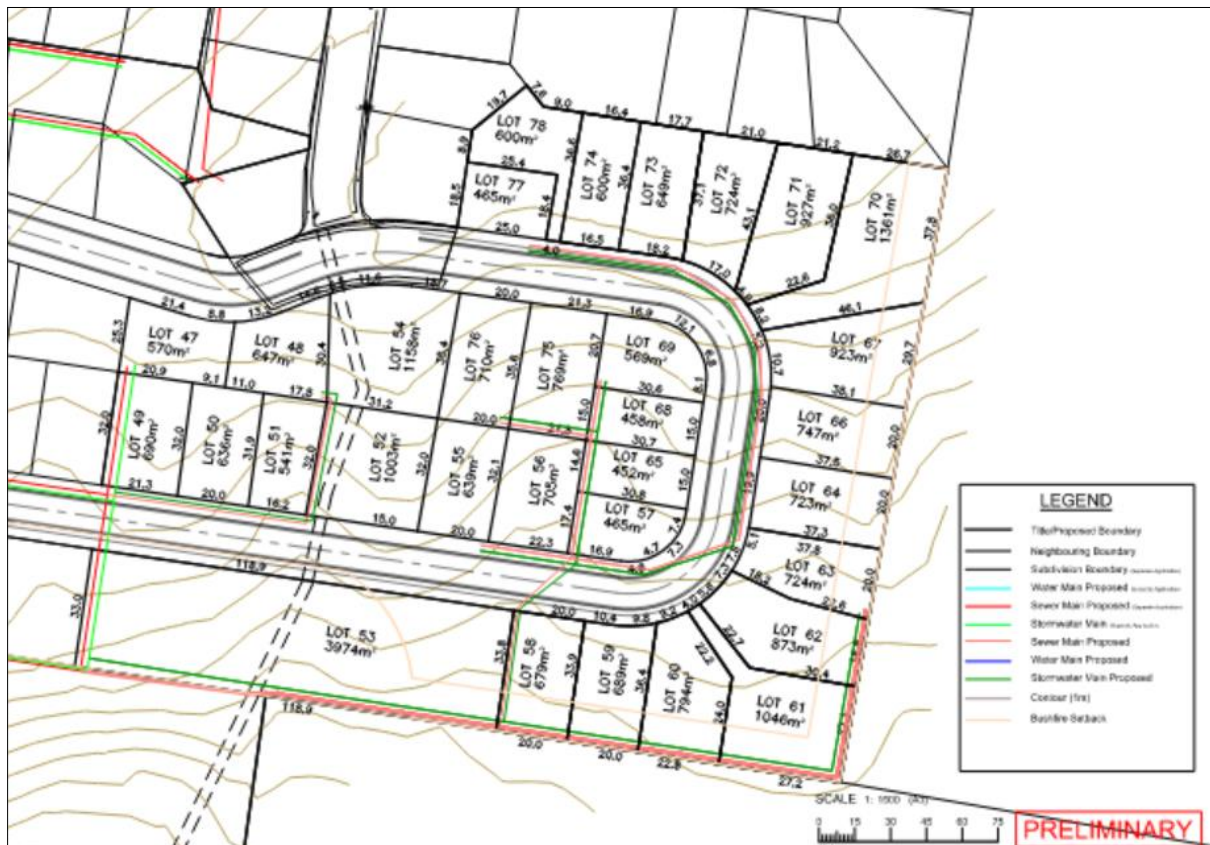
Proposed 32 Lot Subdivision (Source: PDA)
